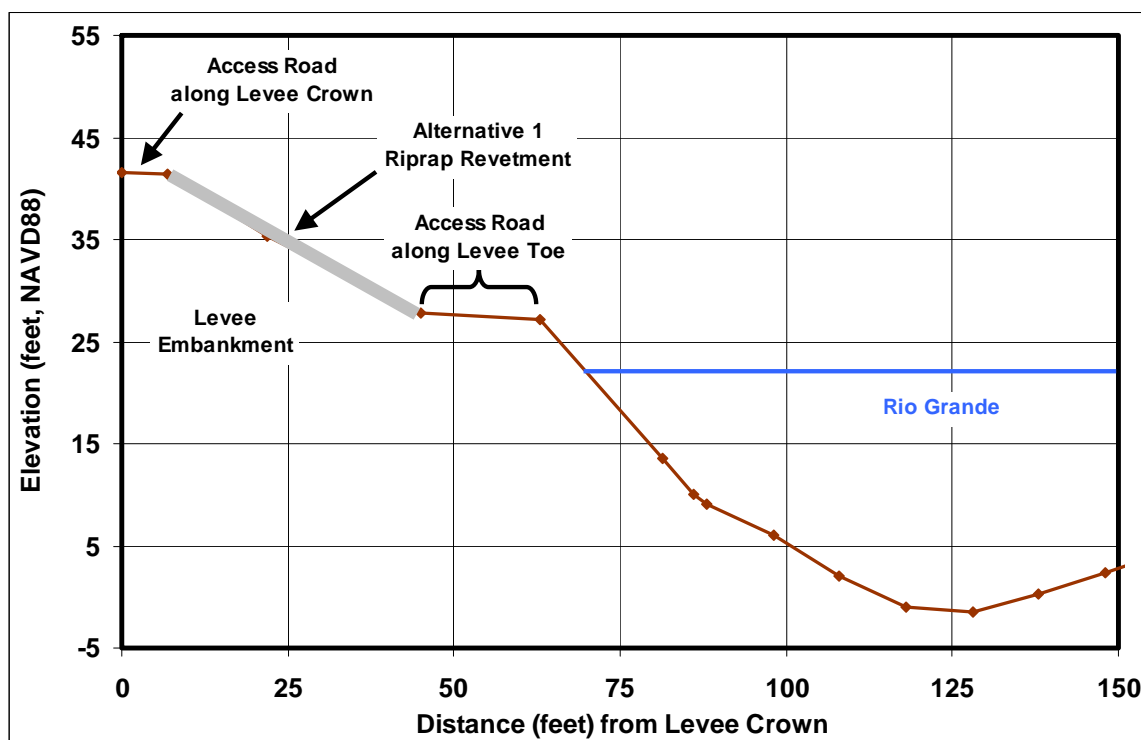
Alternative 1 Embankment Protection – Riprap Revetment on Upper Bank Only
